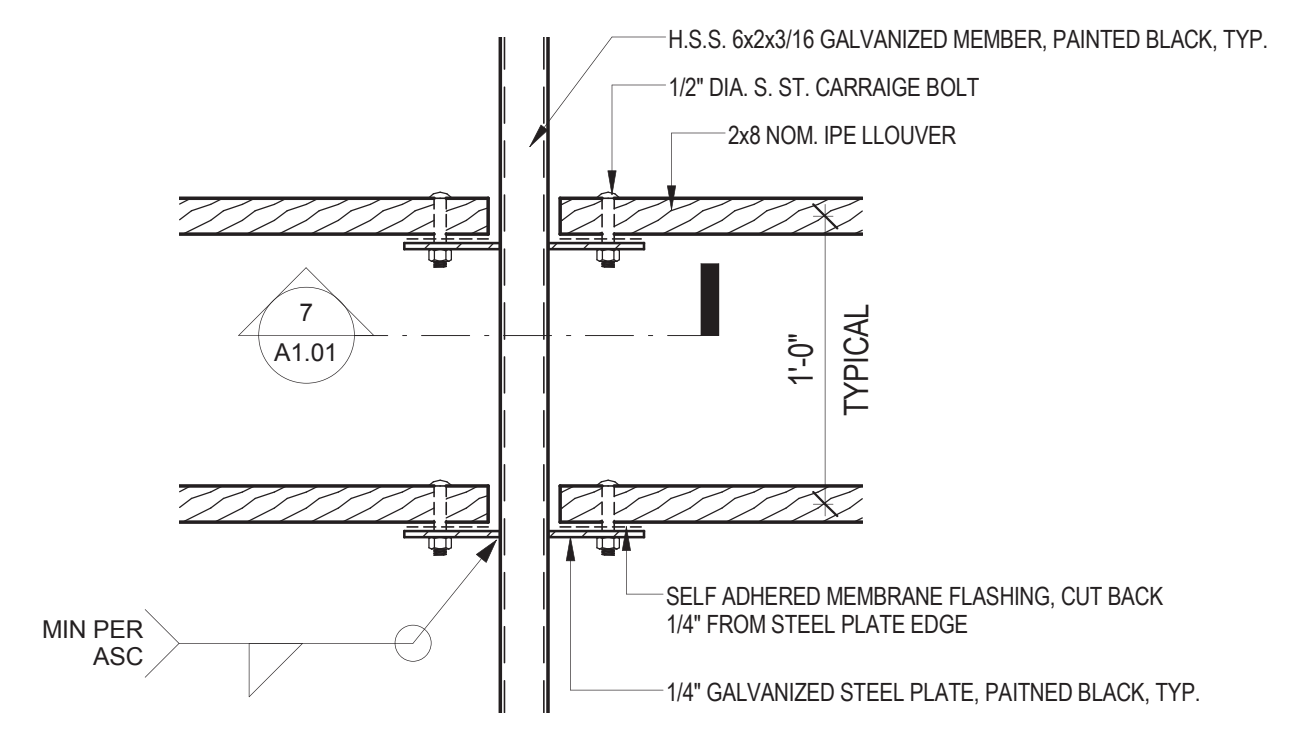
DETAIL - PERIMETER WOOD CONNECTION 1 1/2" = 1'-0" 4
